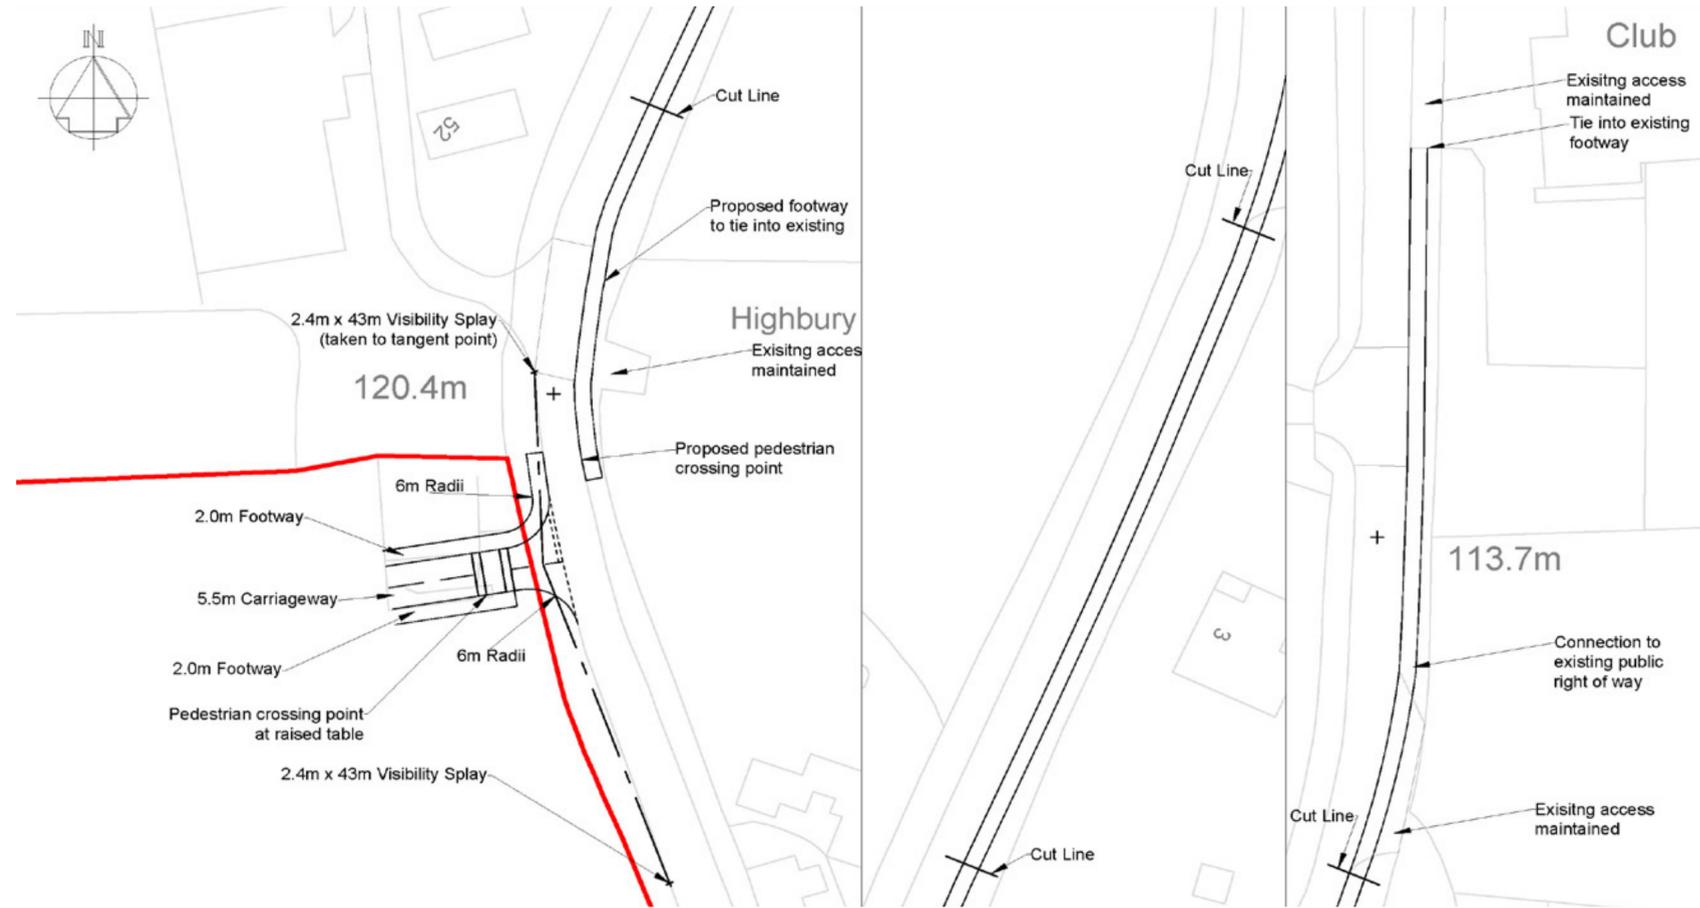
| PROPOSED ACCESS | NOT TO SCALE
